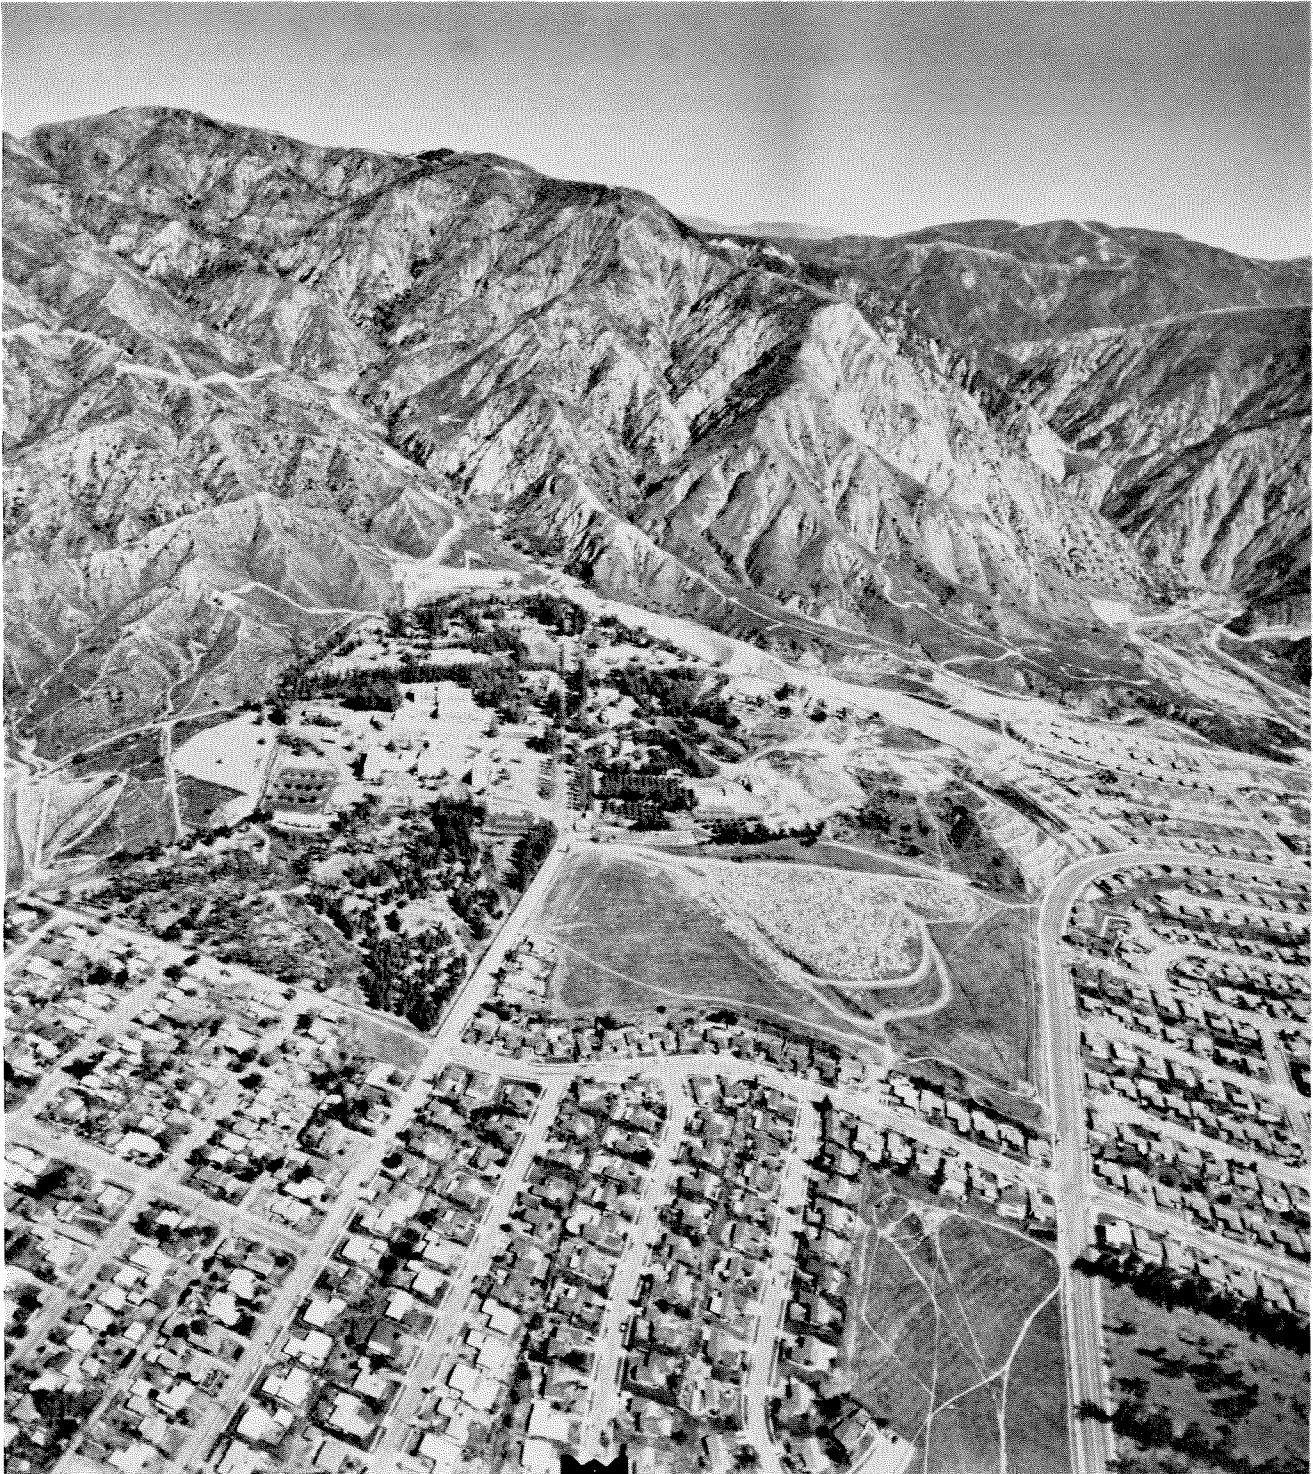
View of Veteran's Administration site looking northeast. Hubbard Avenue is on the right and Sayre Street is on the left running into the hospital grounds. In the field between Sayre Street and Hubbard Avenue, the heart-shaped area is formed by the pieces of the collapsed building which were trucked here as the remains of the building were carefully picked up piece by piece during the search for survivors. Pacoima Dam is visible in the background.
